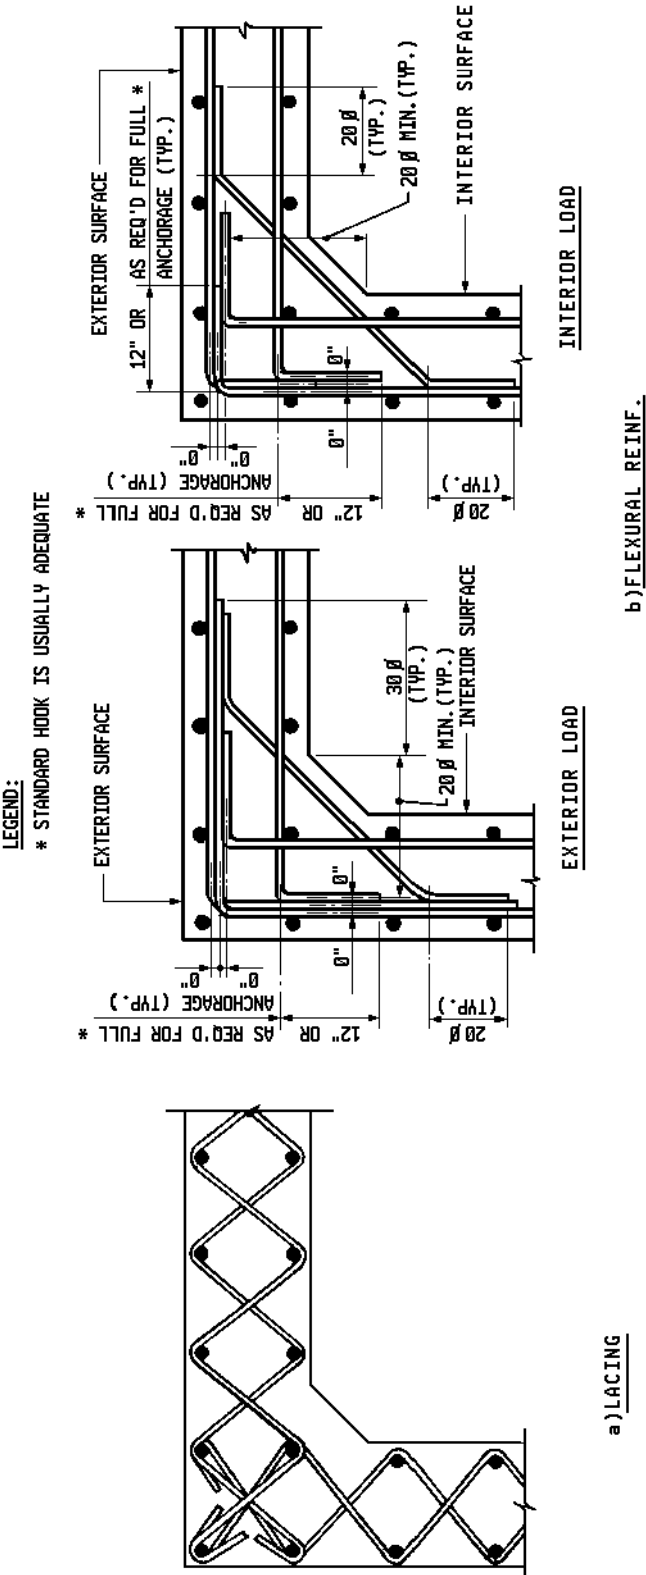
Corner Details for Laced Walls Without Wall Extensions
